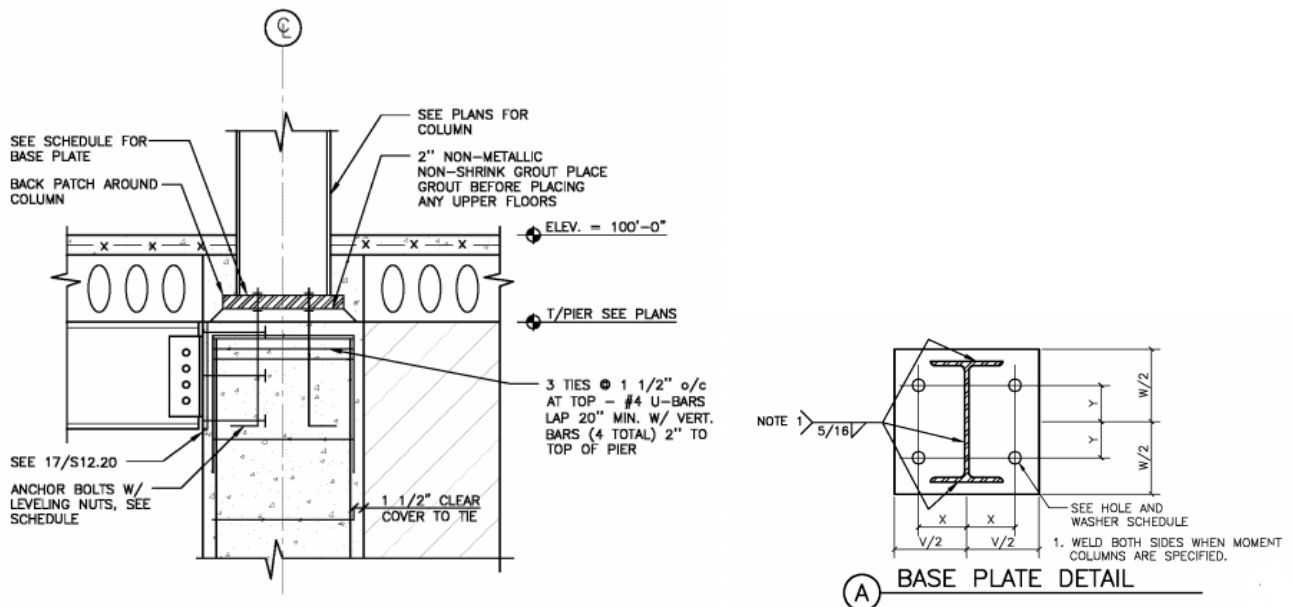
Steel Column on Concrete Pier and Base Plate Detail (S12.22 Drawing 10, S13.3 Drawing A)
